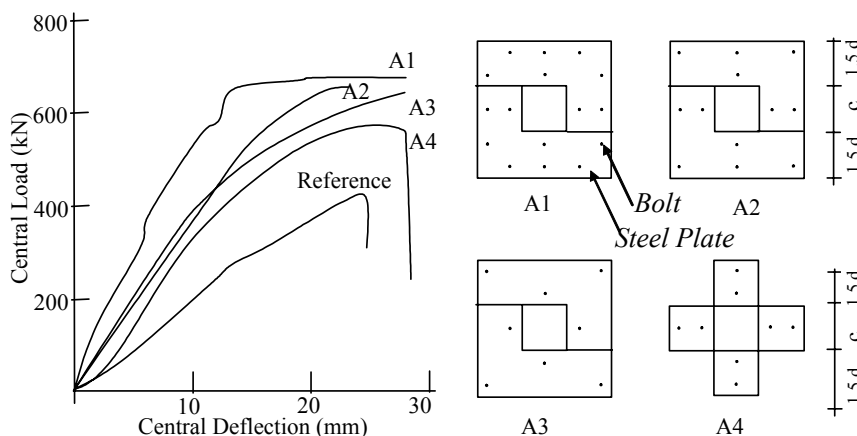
Strengthening of Concentrically Loaded Slabs Using Steel Plates and Bolts (Ebead and Marzouk 2002)
